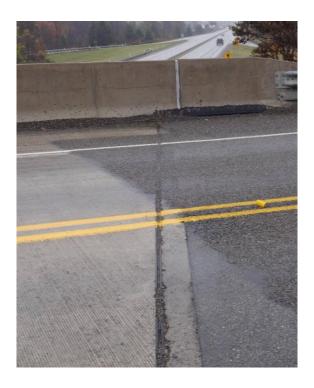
Maintenance works overlapping on expansion joint and deterioration of concrete edges
